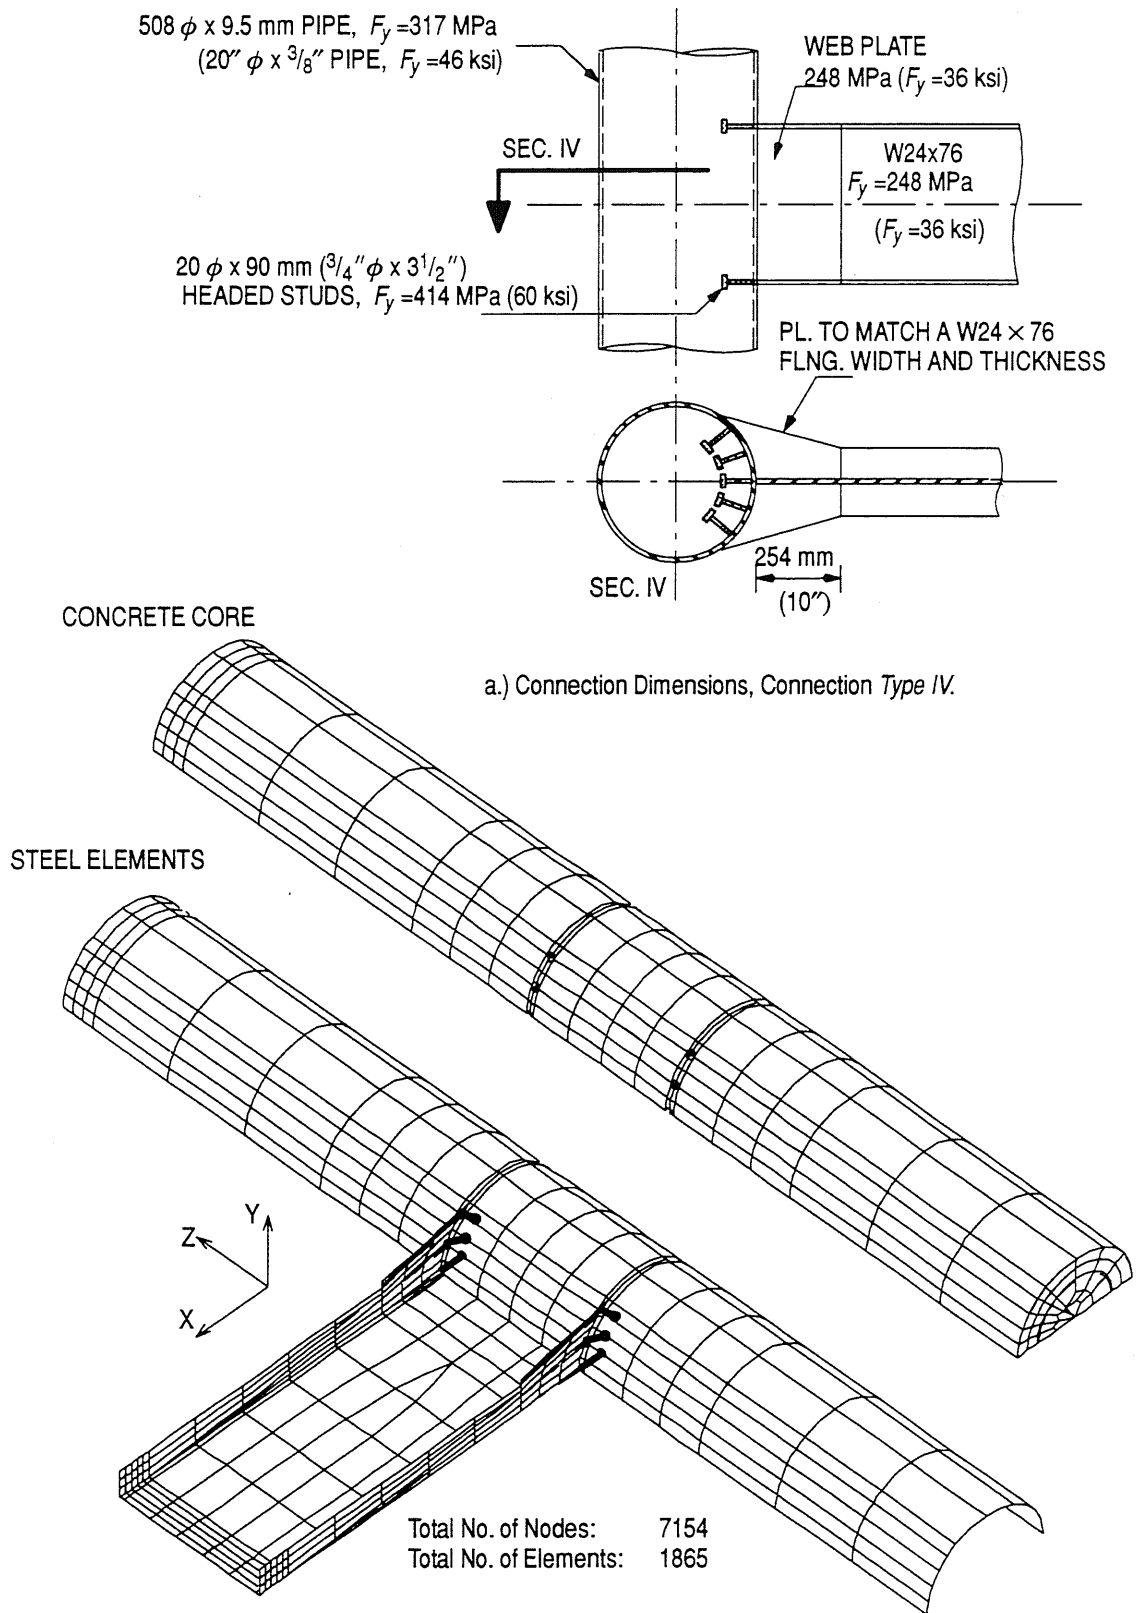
3-D Finite Element Model for Connection Type IV
